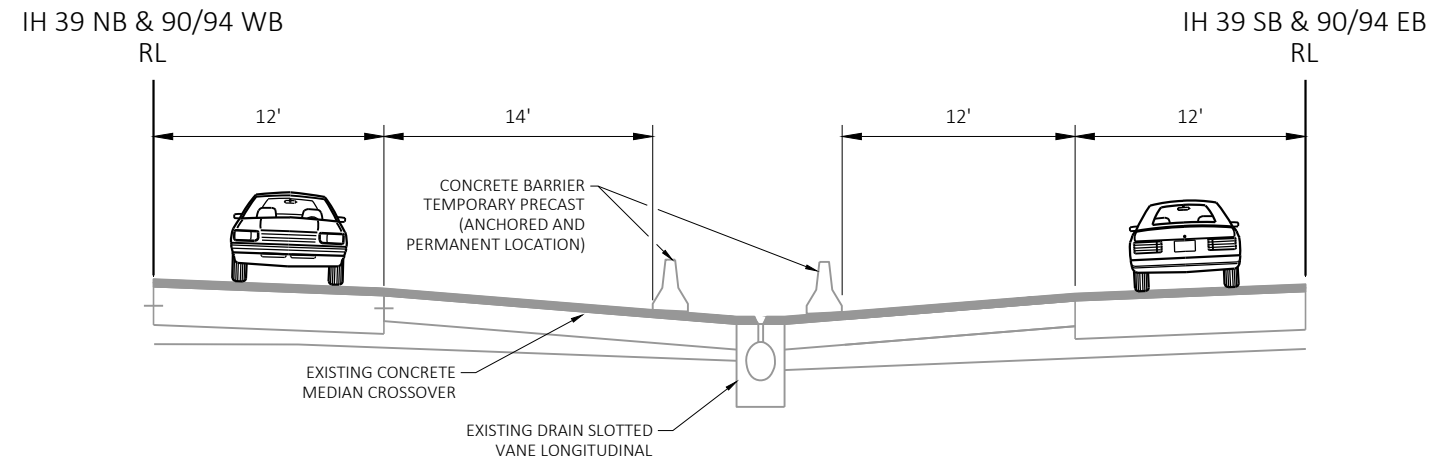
DETAIL OF PAVEMENT TAPER AT INLET LOCATIONS
